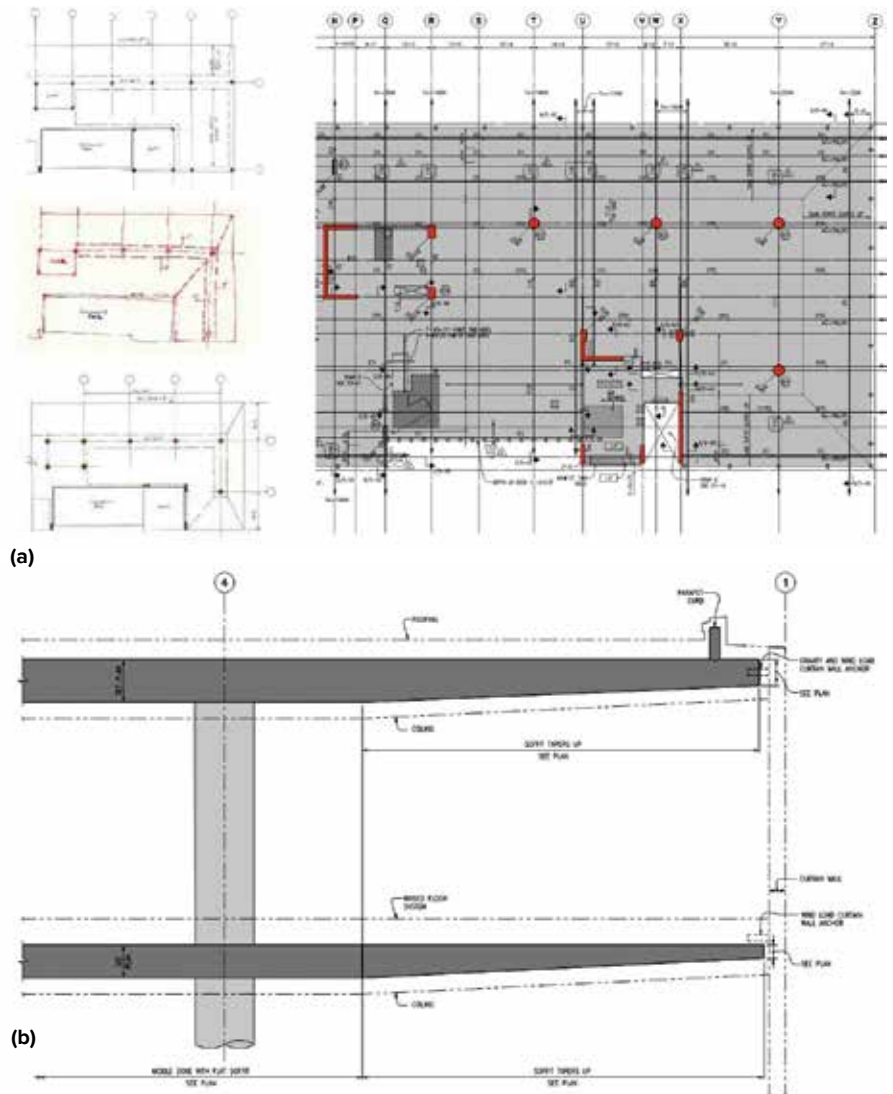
Structural concept development: (a) flat slab system; and (b) typical floor and roof cross sections
